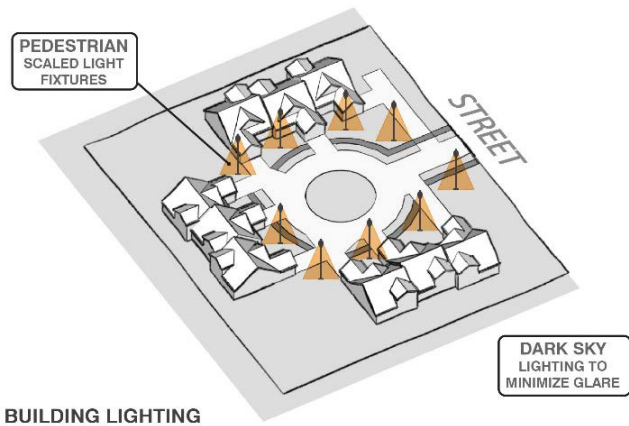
Lighting should be integrated with the site design and reinforce pedestrian safety
